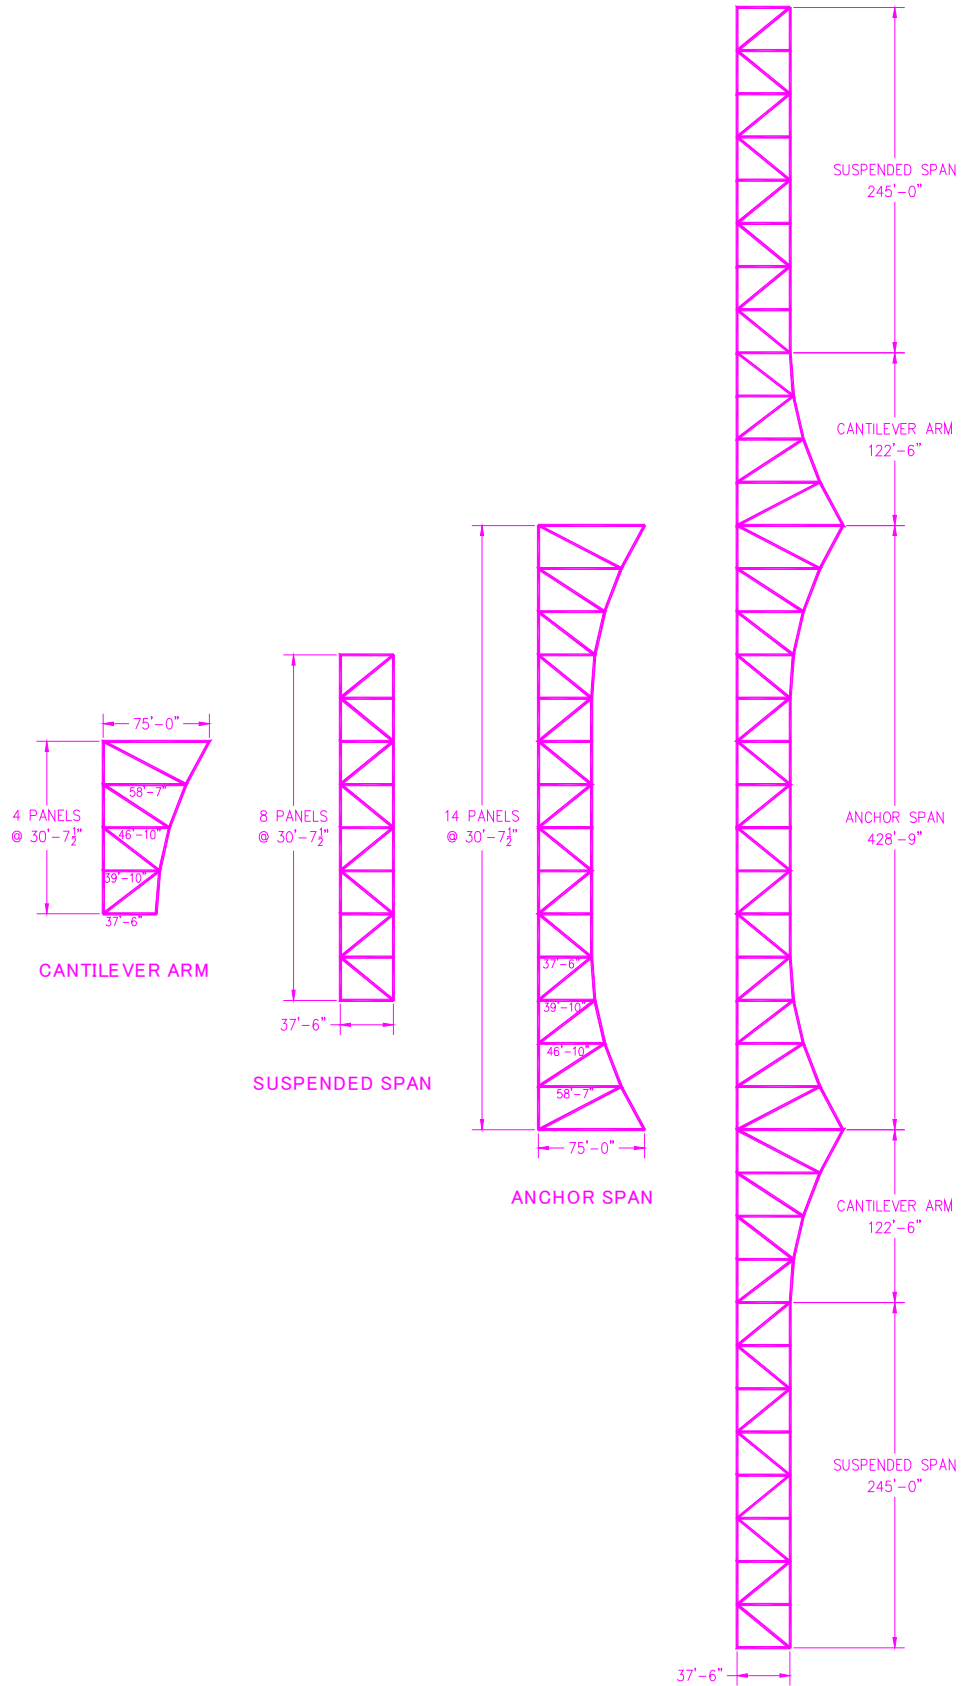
Truss Panel Arrangements of Tydings Memorial Bridge
